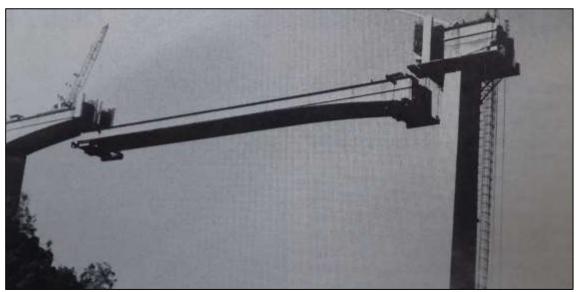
A 975-ton, 344-foot section between Piers 3 and 4 lifted into place in August 1975.³
